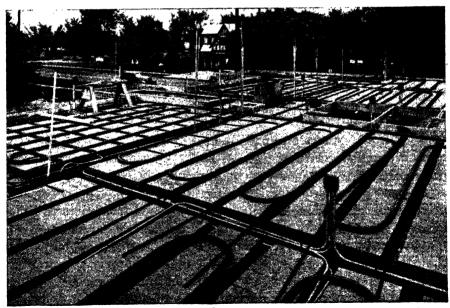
Radiantly heated floor construction. (A. M. Byers Company.)
